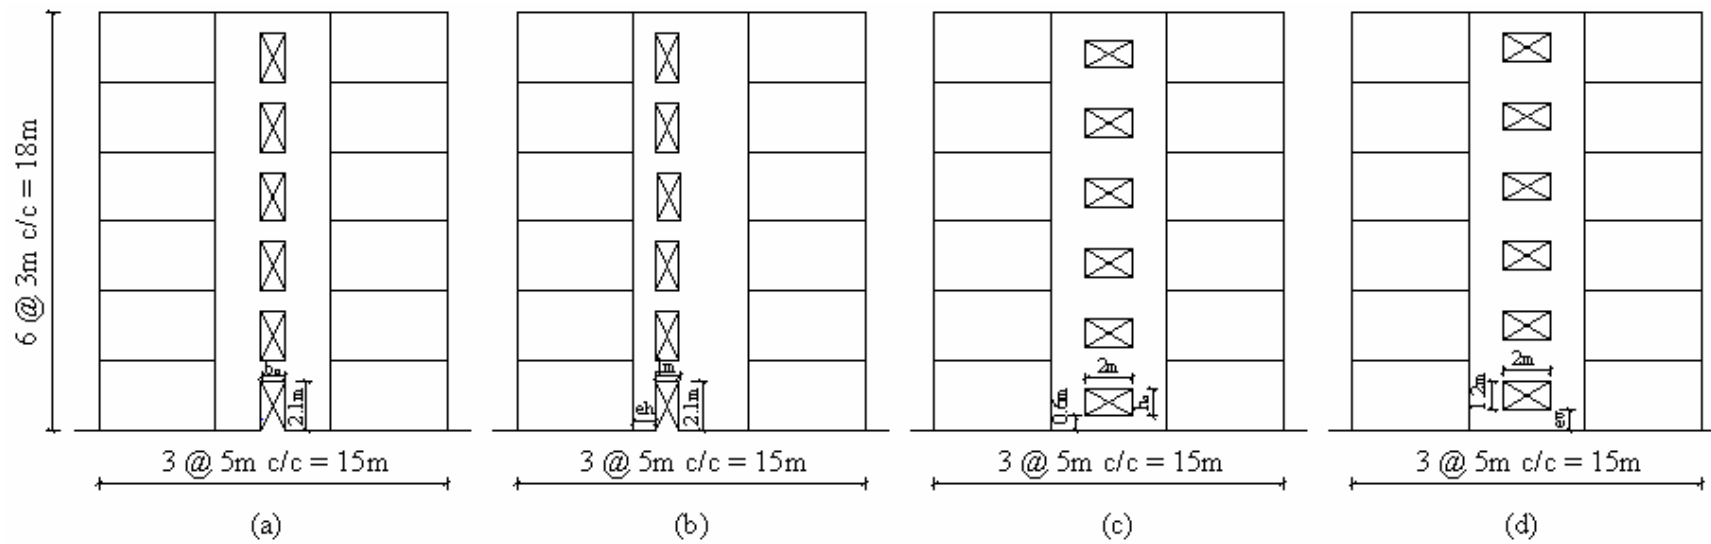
Sections of 6-story buildings with different sizes and locations of door and window openings in shear walls
